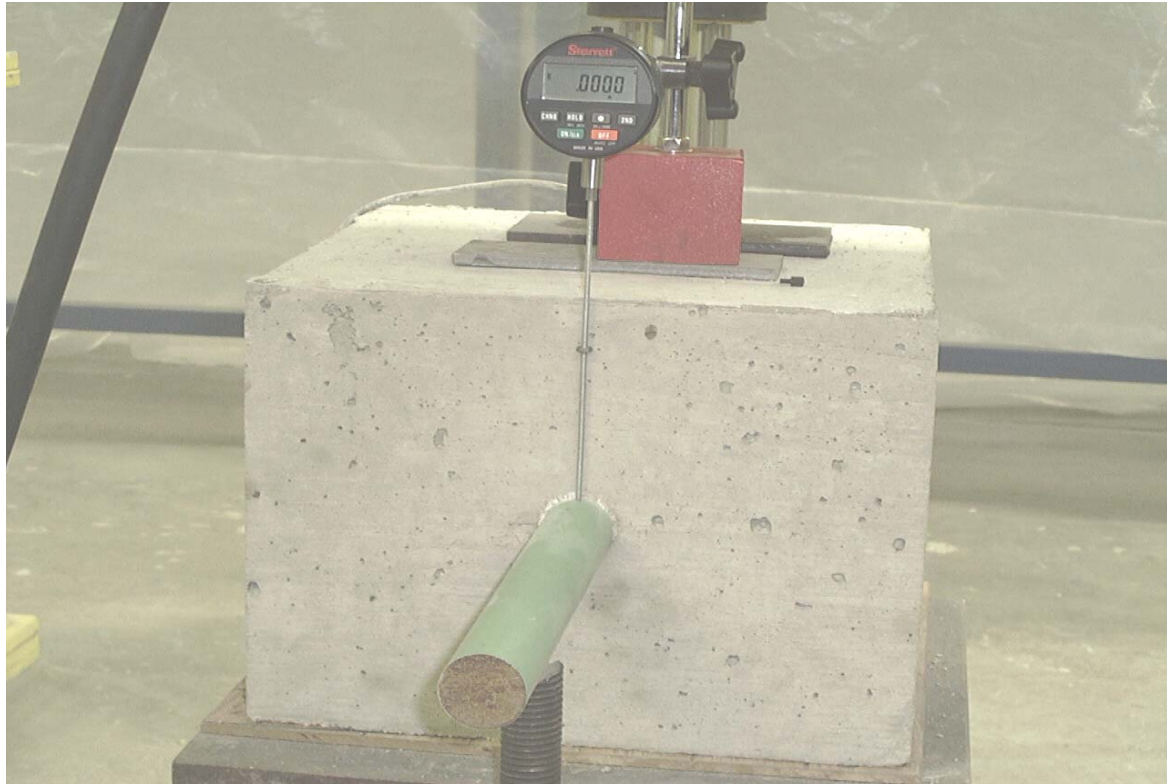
9x12x12 Exposed Dowel Specimen
